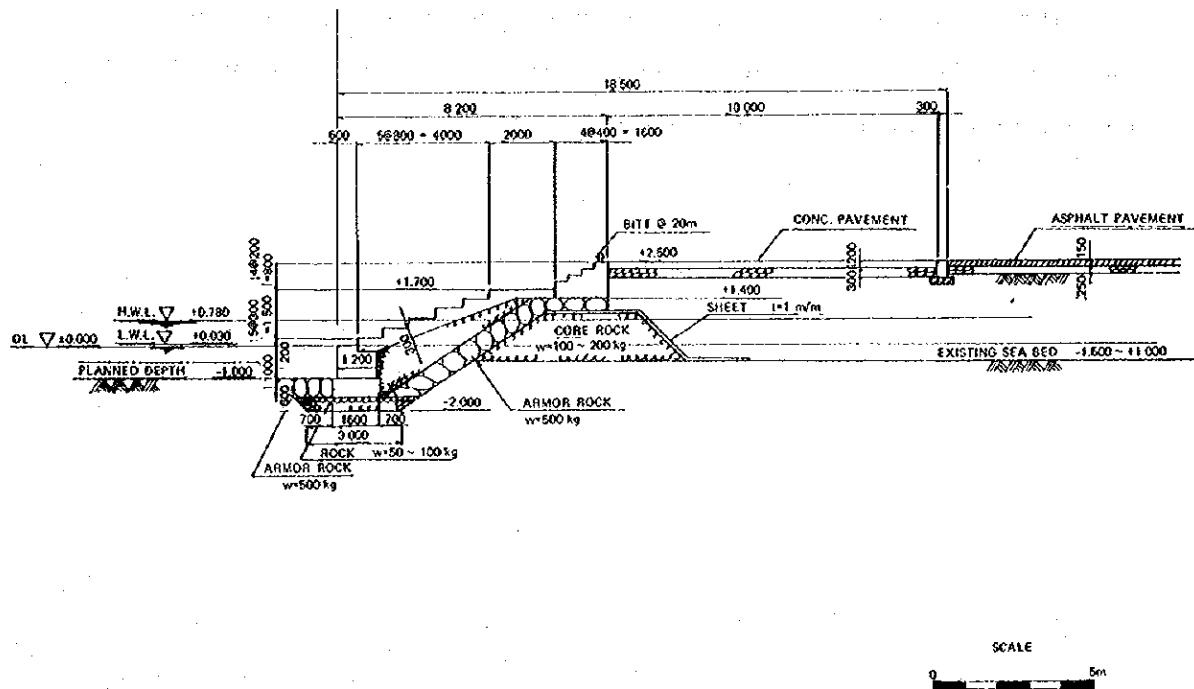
Cross Section of Stair Landing – Zamboanga Port
